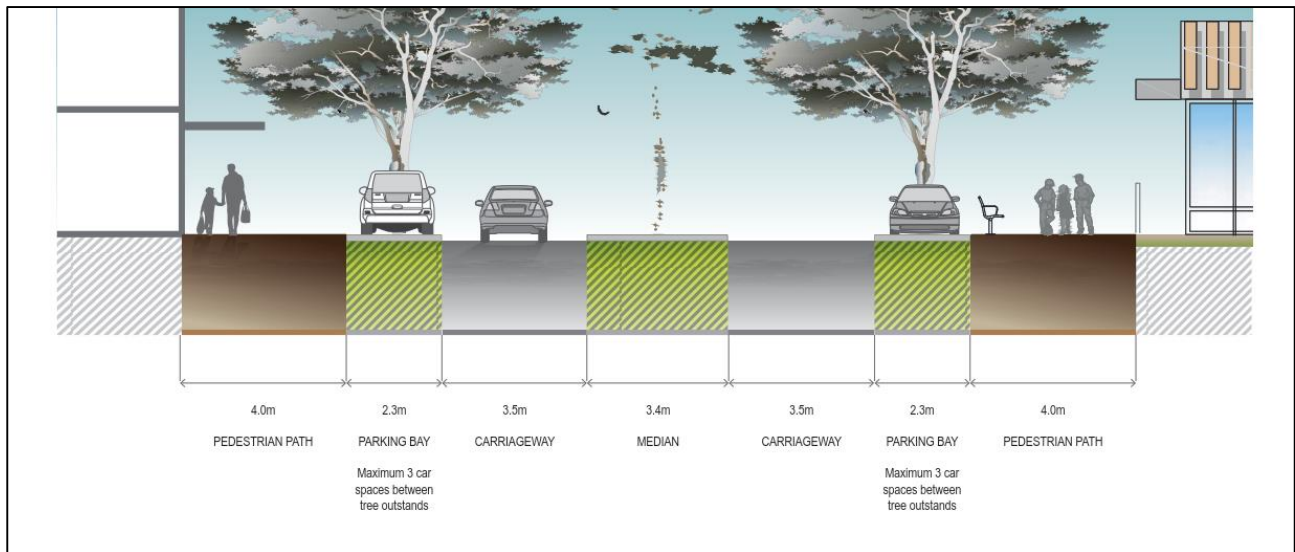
Boulevard Connector Street (CS03b – 29 metres)
